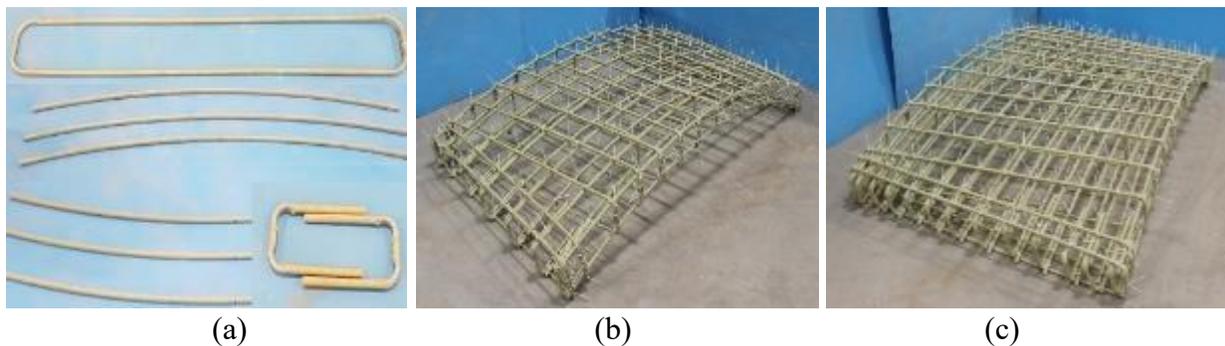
Overview of (a) GFRP bars and ties; (b) assembled GFRP cage for specimens with 7 top and bottom longitudinal bars and (c) assembled GFRP cage for the specimens with 13 top and bottom longitudinal bars.
